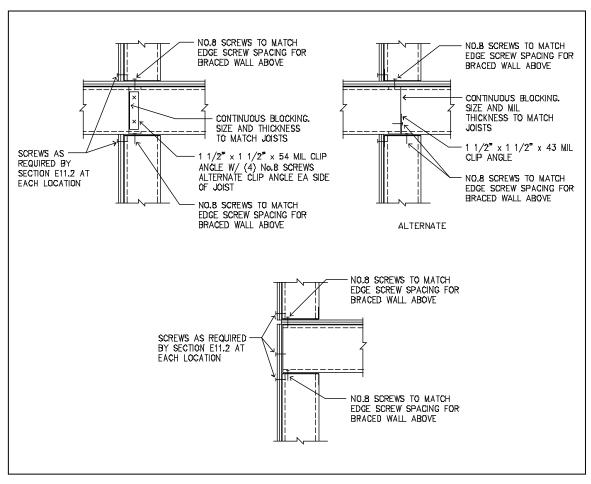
Floor Diaphragm Attachment to Braced Walls
